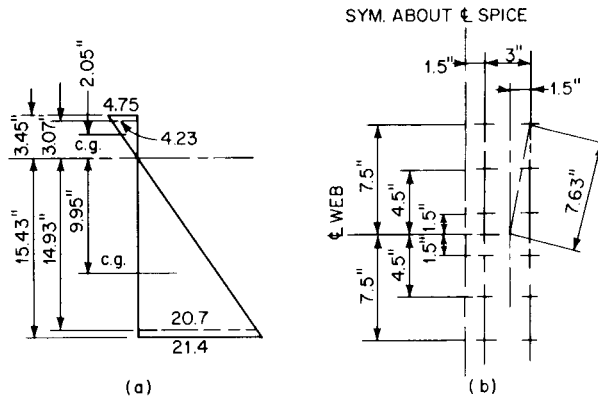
(a) Bending stresses in floorbeam at supports. (b) Bolted web connection of floorbeam to girder.
